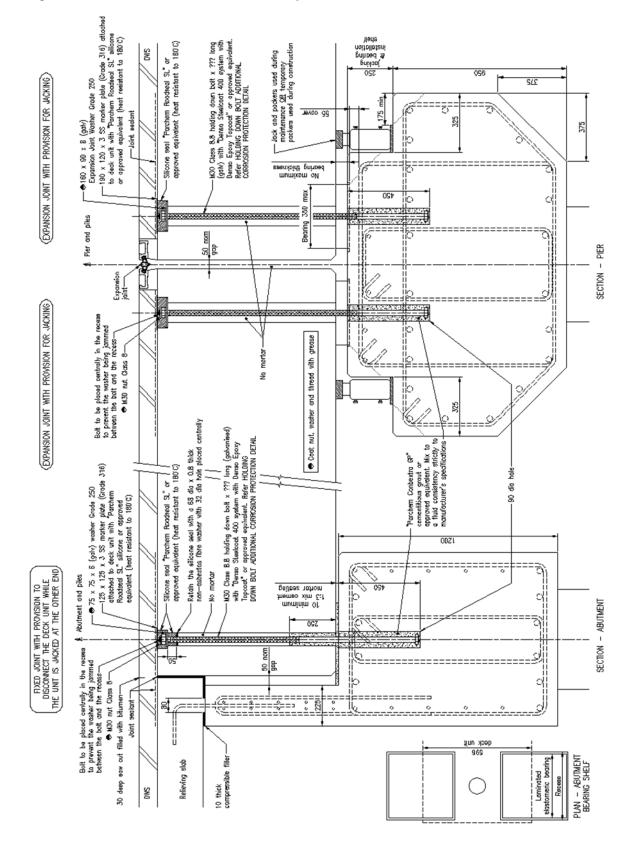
Fixed Abutment Joint and Expansion Pier Joints – DWS on Deck Units ≤20 m
